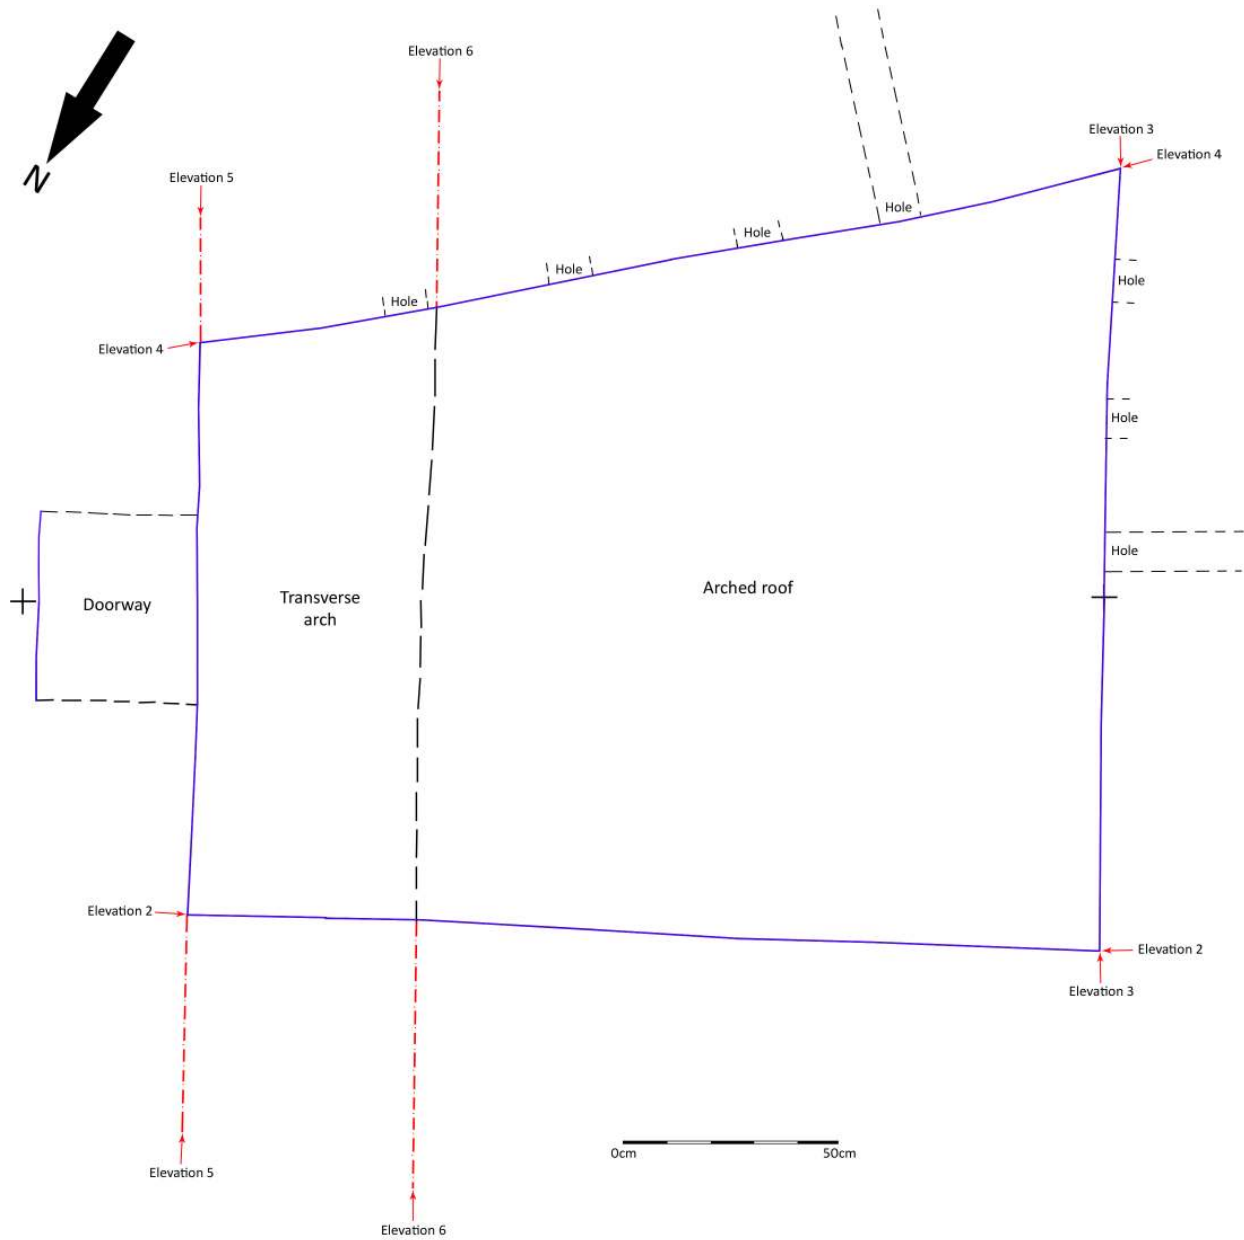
Plan 1 of the underground structure showing the trapezoid shape, extent of the arched ceiling, doorway in the NE face and drainage holes / slots
